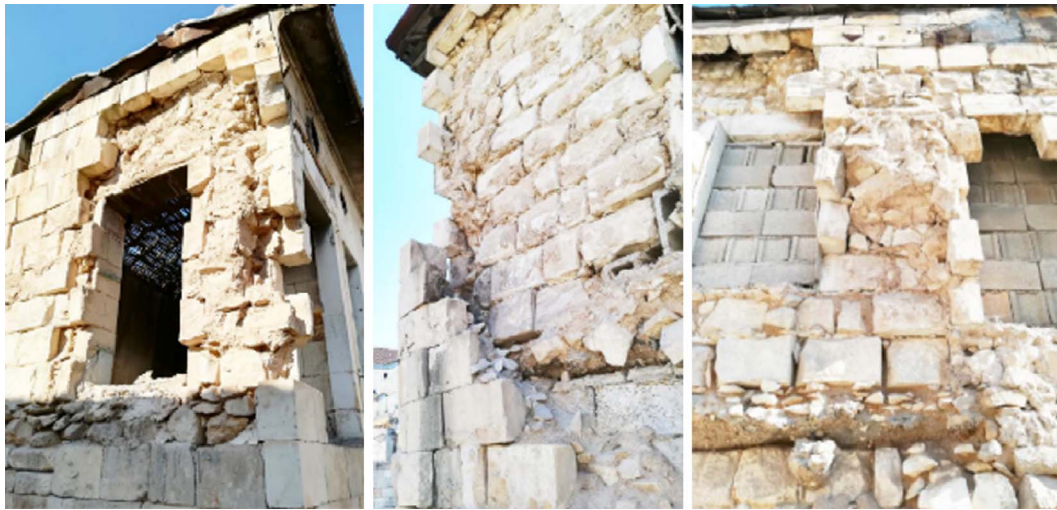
Gaziantep traditional wall detail; Keymik and Havara stone example.
